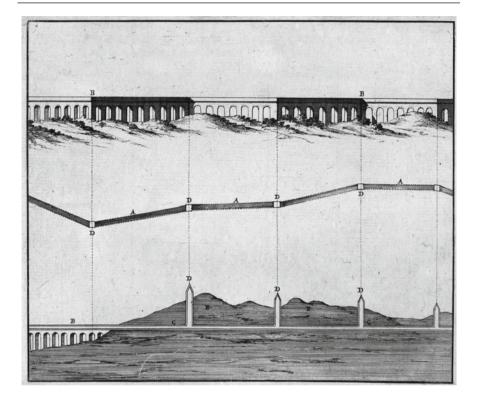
Elevation, plan, and section of an aqueduct, from C. Fontana, Utilissimo trattato dell'acque correnti... (1696). Washington, DC: Dumbarton Oaks
